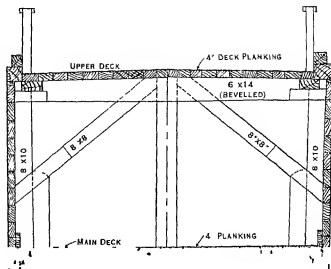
TIMBER CAISSON GATE FOR GRAVING DOCK AT SAVANNAH, GA.
